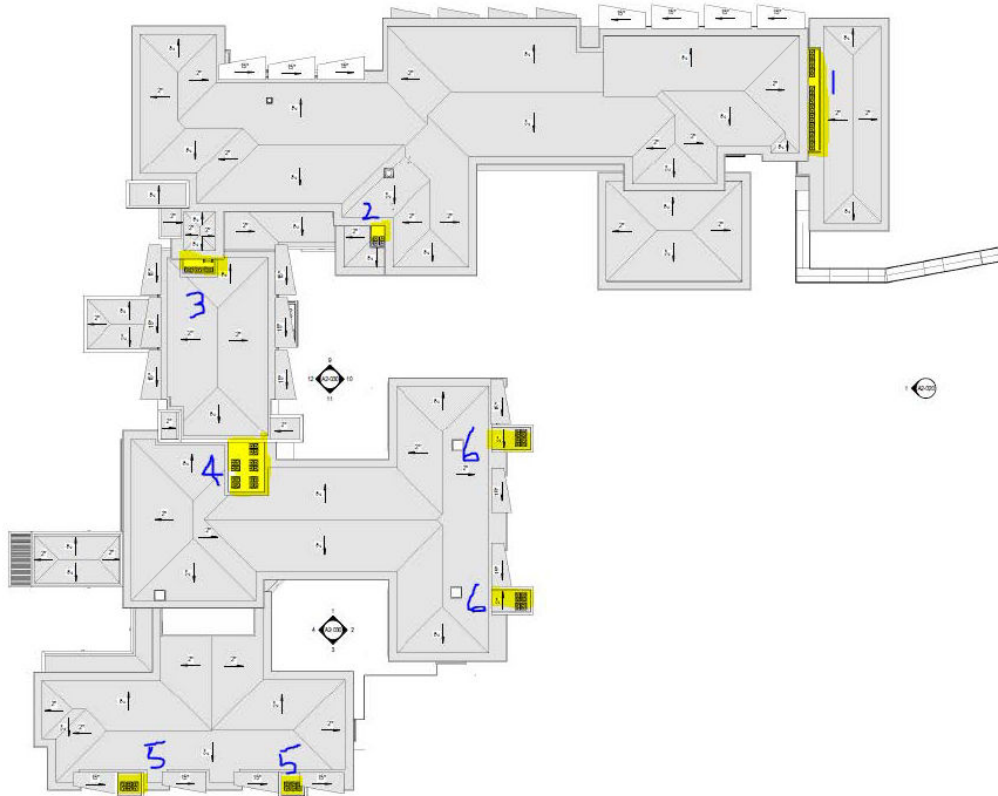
A plan of the roof of Building B01 denoting the location and various means of screening the mechanical plant.
